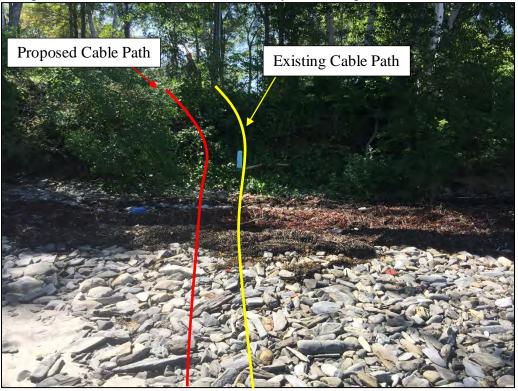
Cushing Island. Facing southwest, proposed and existing cable path from the beach.
